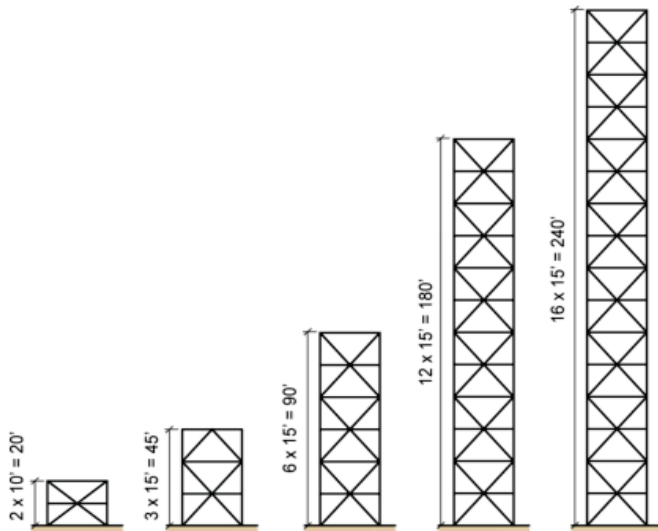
Braced-frame archetype elevations from NIST GCR 10-917-8.
